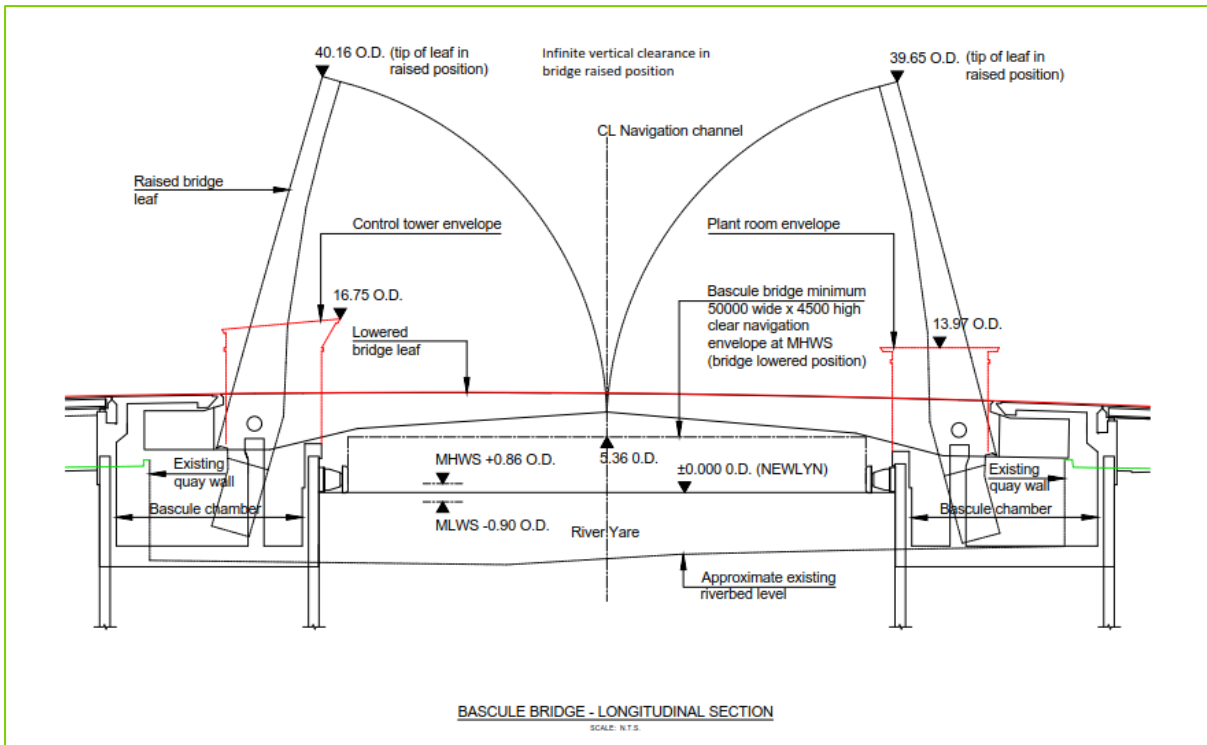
Longitudinal Profile of the Bascule Bridge in The Lowered Position
